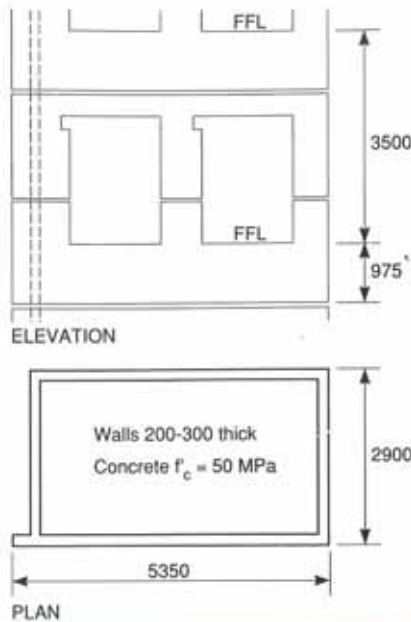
LIFTSHAFT WALL UNITS FOR 51 DRUITT STREET, SYDNEY
